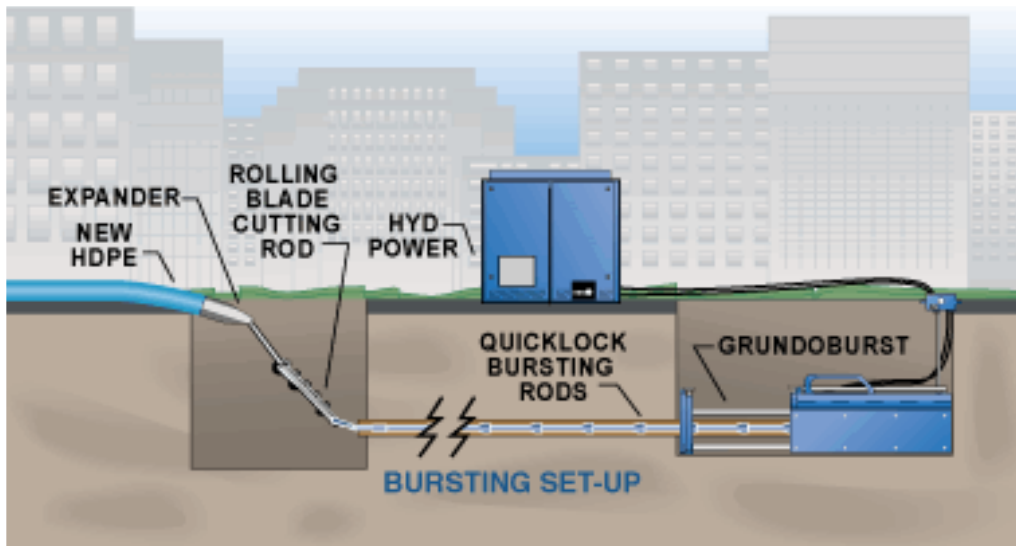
Static Pipe Bursting (www.tttechnologies.com)
